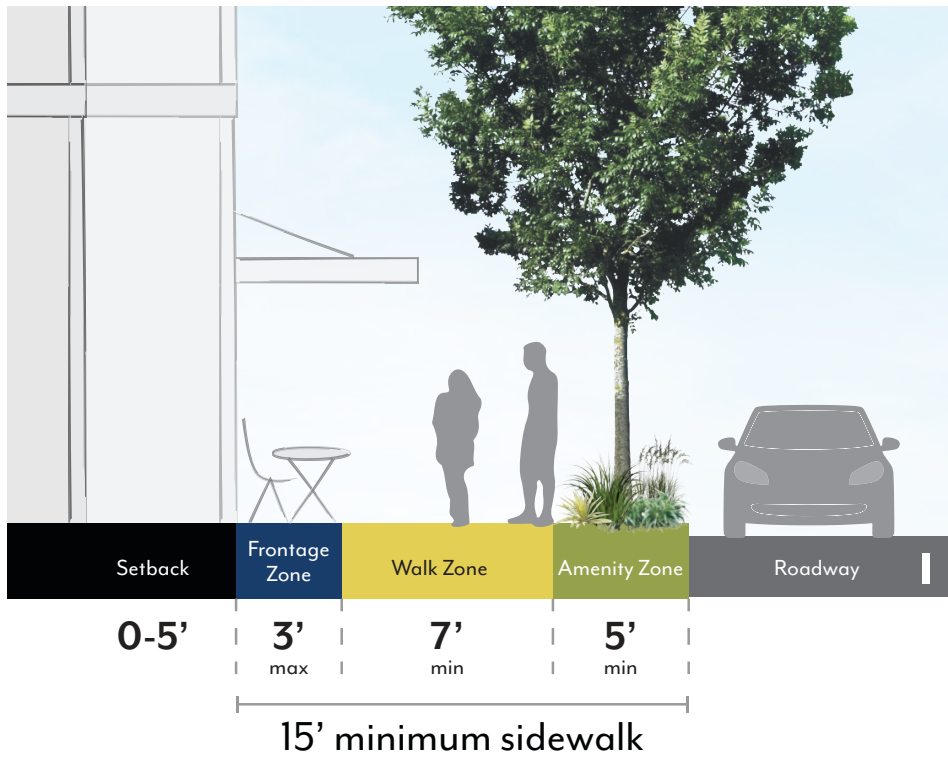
Sidewalks - Mixed Use (MU-48)
